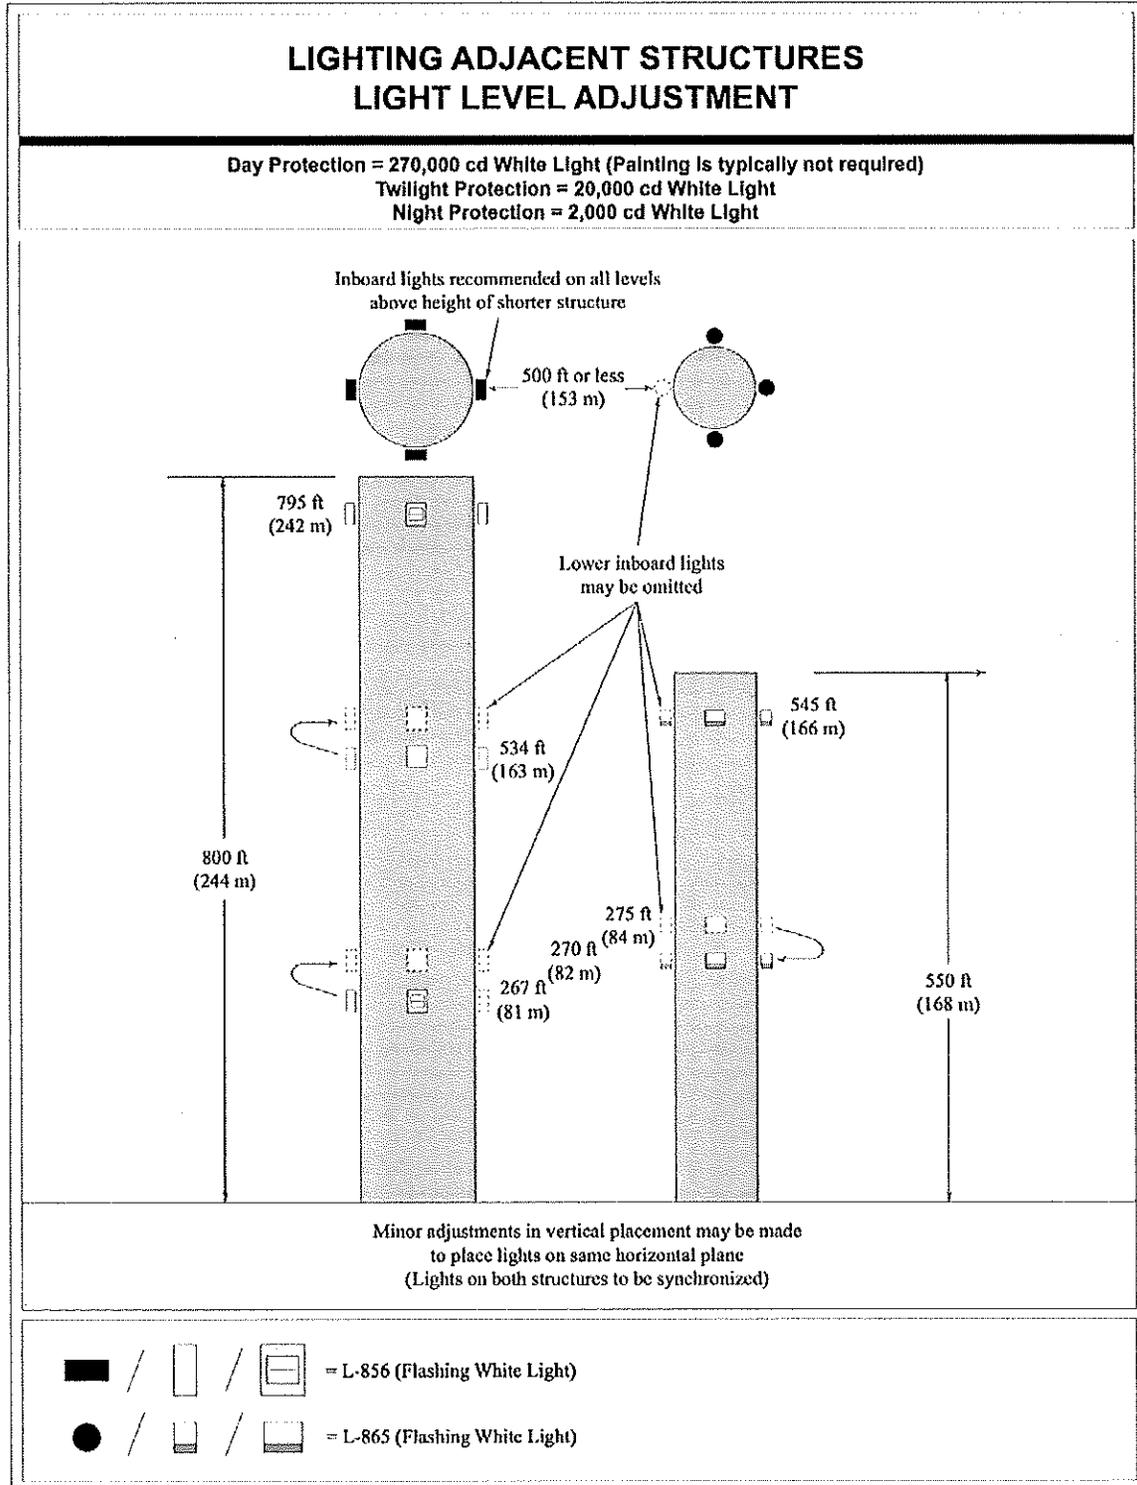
Lighting Adjacent Structures—Light Level Adjustment
